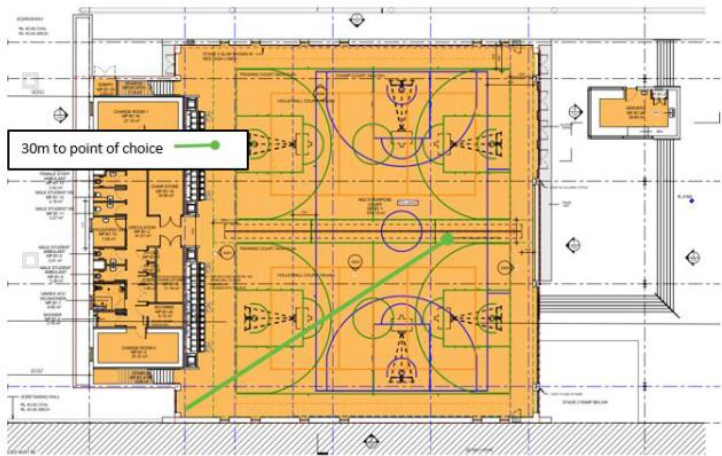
Extended Travel Distance within Multipurpose Pavilion Building (Level 0 - GF)
